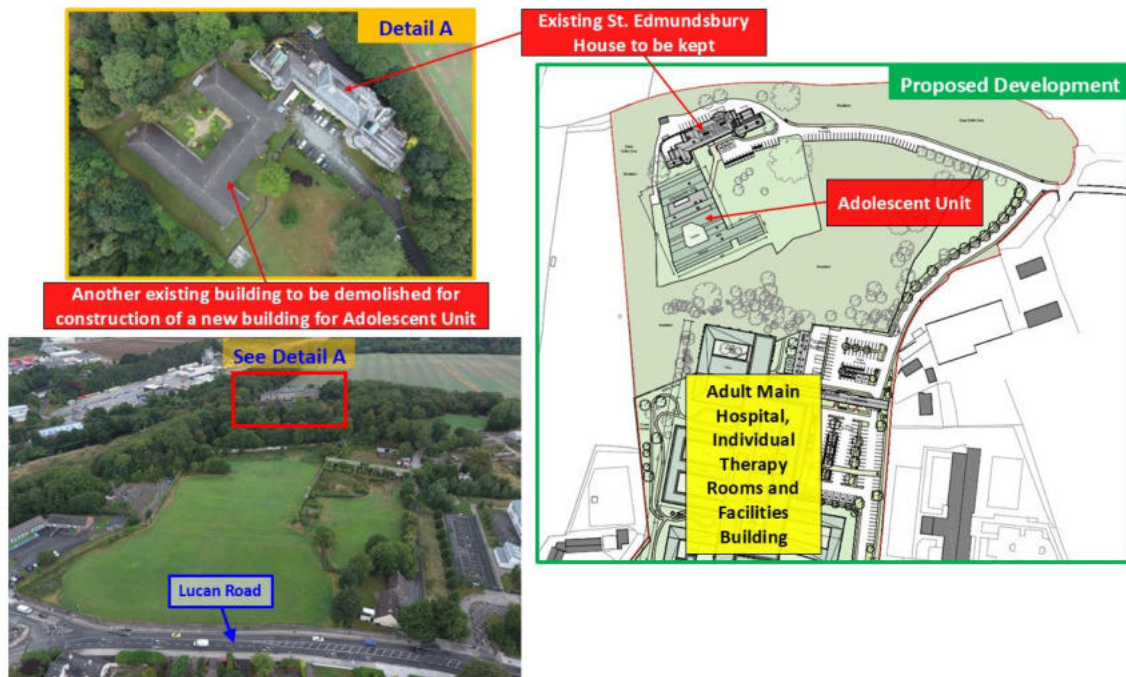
EXISTING AND PROPOSED STRUCTURES
